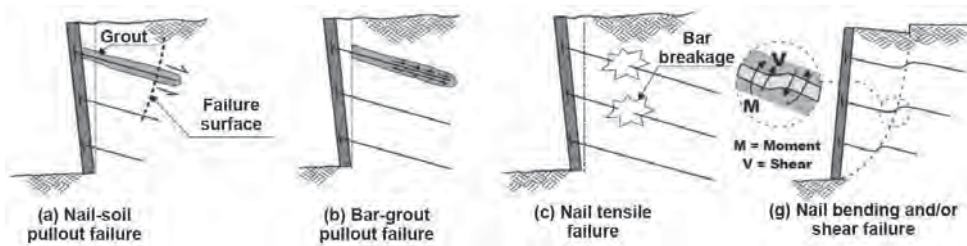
Internal failure modes of soil nailed walls (Lazarte et al., 2003).
